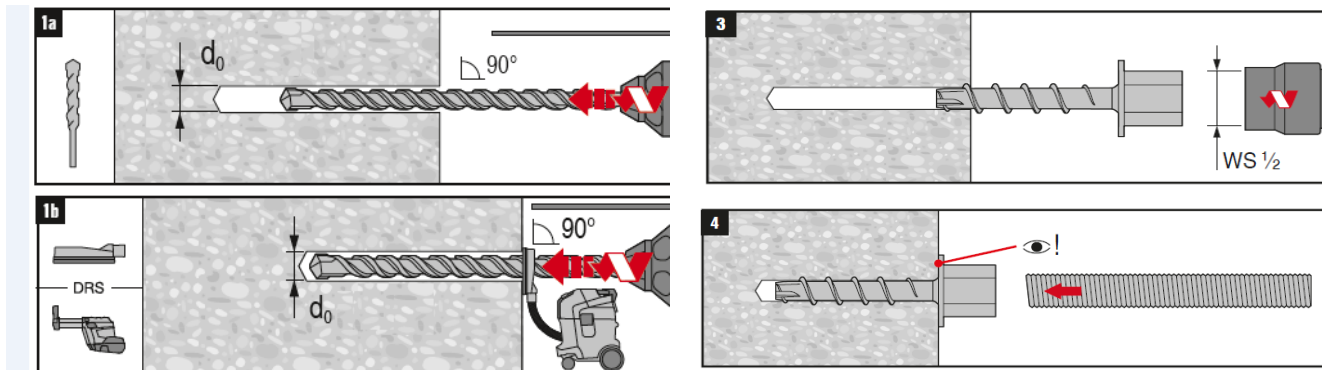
B—INSTALLATION INSTRUCTIONS – HILTI KH-EZ I SCREW ANCHORS
